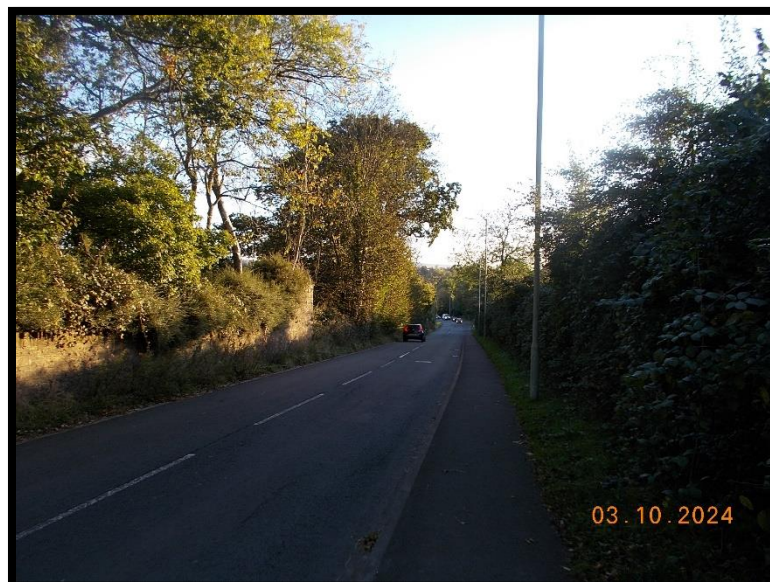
On-street parking reducing the usable width along the B4595 Llantrisant Road, It is noted however that the opposite footway is available
